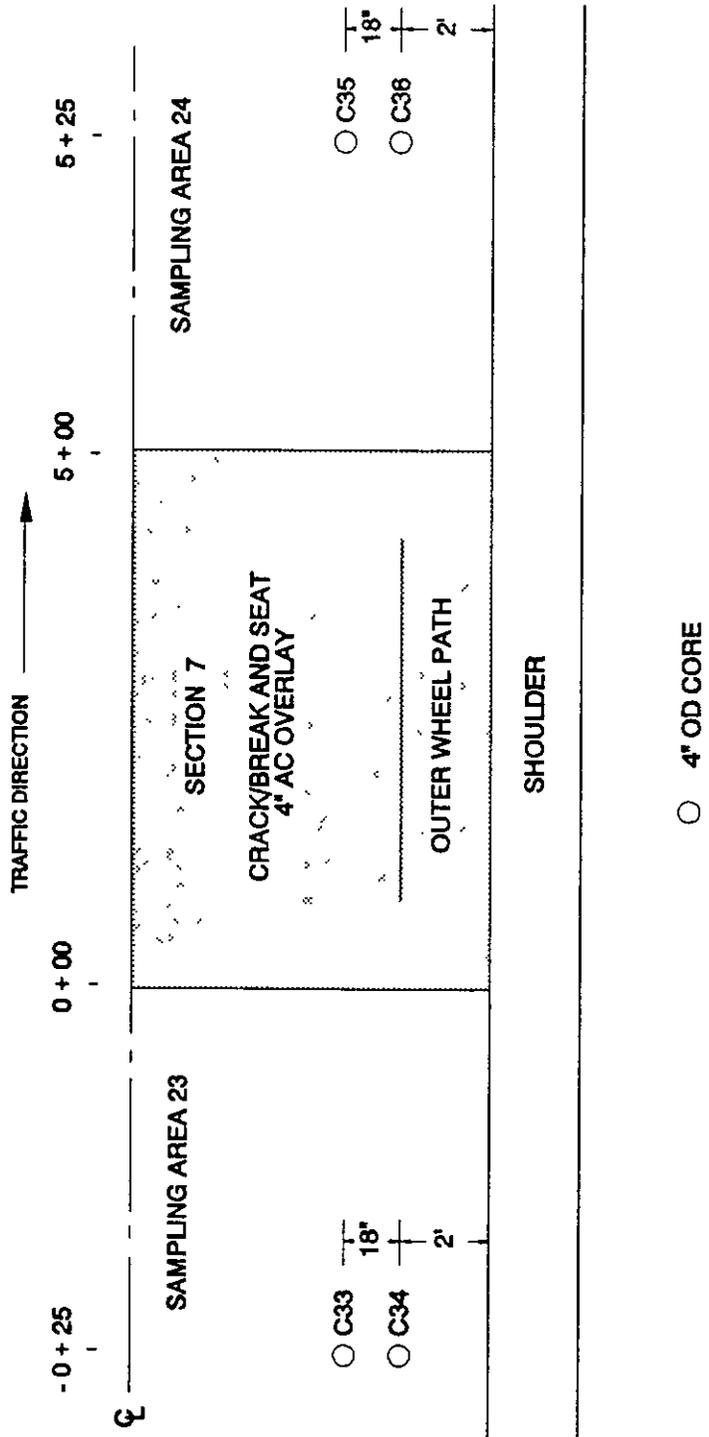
Example of "Post-Construction" Sampling Plan for Test Section 7
